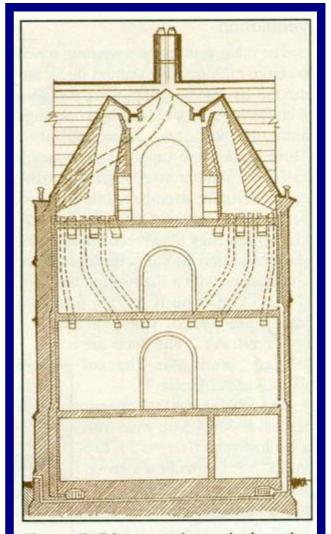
Diagramatic vertical section shows how fresh air is supplied in brick tunnels with batteries of steam pipes under the basement. The warm air flows up risers within the brick walls, skipping the basement floor to grilles at other floor levels. Exhaust grilles at the ceilings connect with brickwork ducts in the cross walls to exhaust plenums under the roof, and then to turrets in towers and pavilions.
